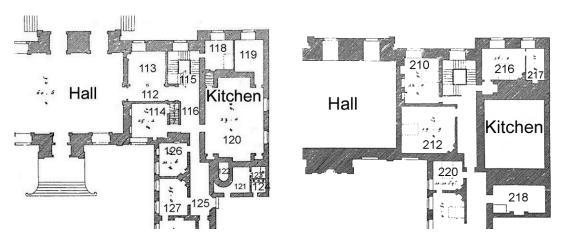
The service area from Colen Campbell's 1717 plan with added room numbers. Ground floor left: first-floor right. East at the top.
